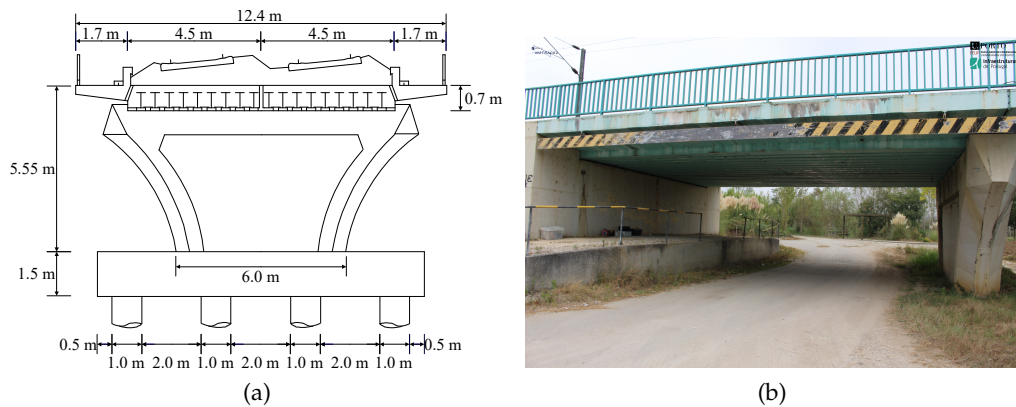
Canelas bridge. (a) cross-section (unit: m) (adapted from Pimentel et al. (2007)); (b) view of the first span.
